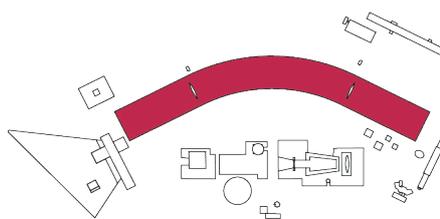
Plans and sections of the restored guest house. <https://www.architectural-review.com/buildings/trade-revival-carpentry-workshop-in-tripoli-lebanon-by-east-architecture-studio-and-oscar-niemeyer>
